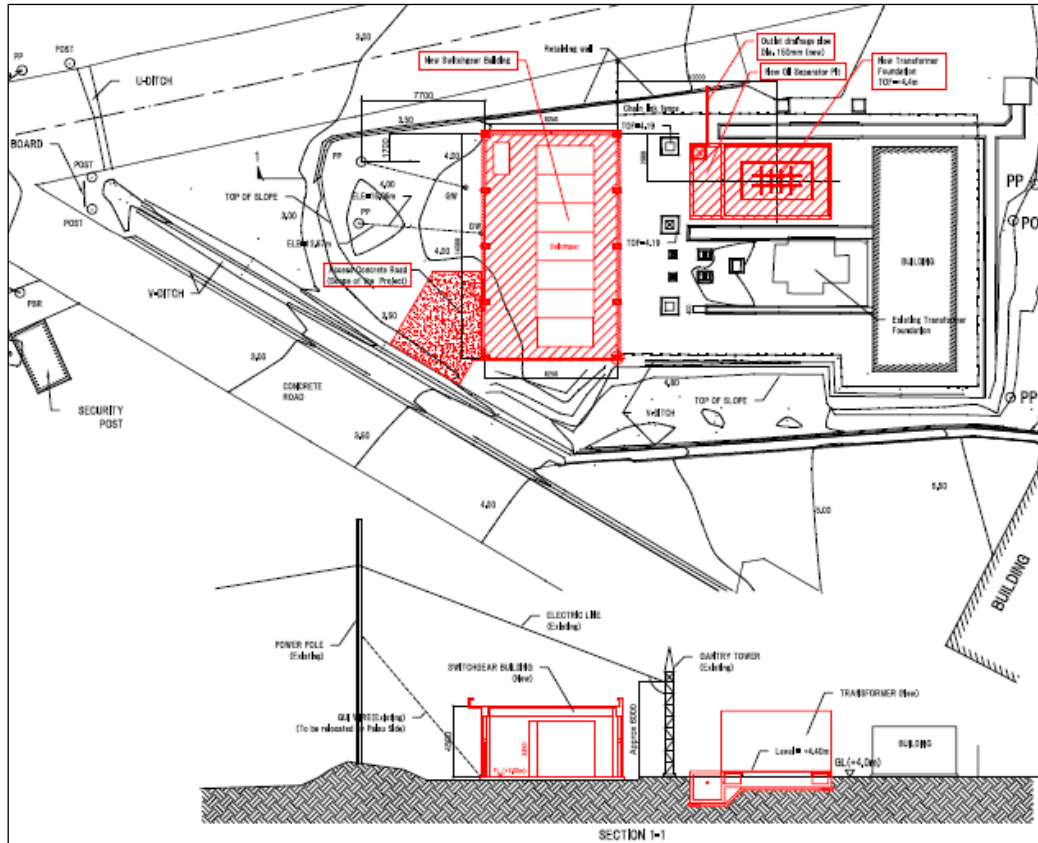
Layout Plan of Malakal Power Plant Switchgear Building
